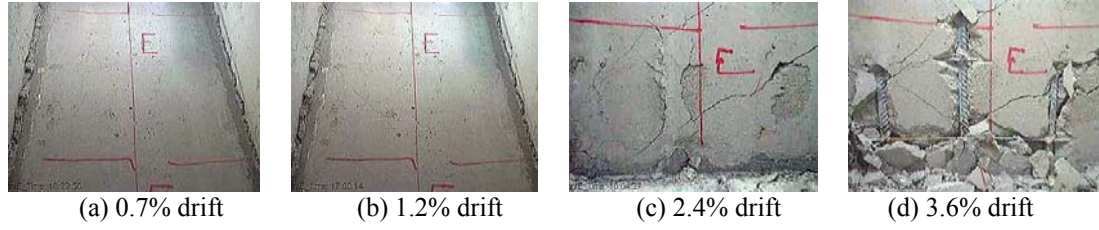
Retrofitted pier PO2-N2 damage from internal east side view.
